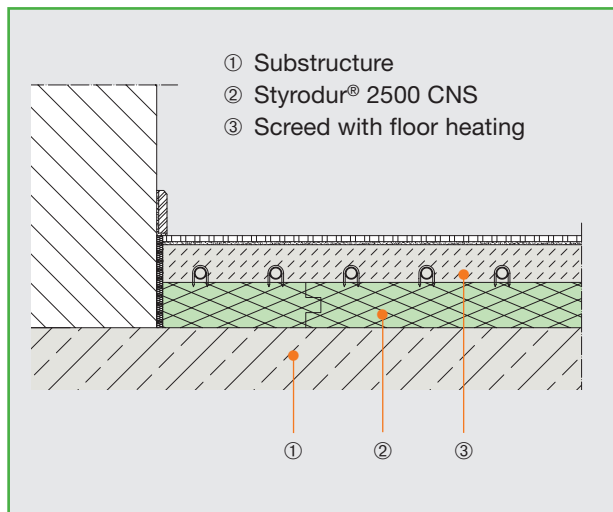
Floor structure with Styrodur® 2500 CNS and floor heating.
